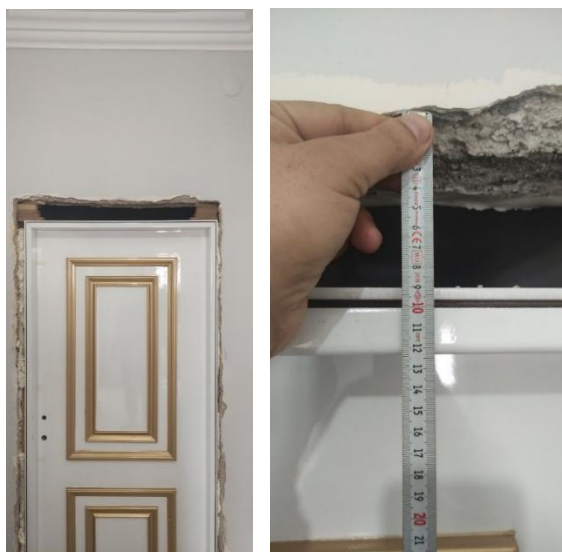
Gaps between the upper door frame and the wall due to manufacturing defects
